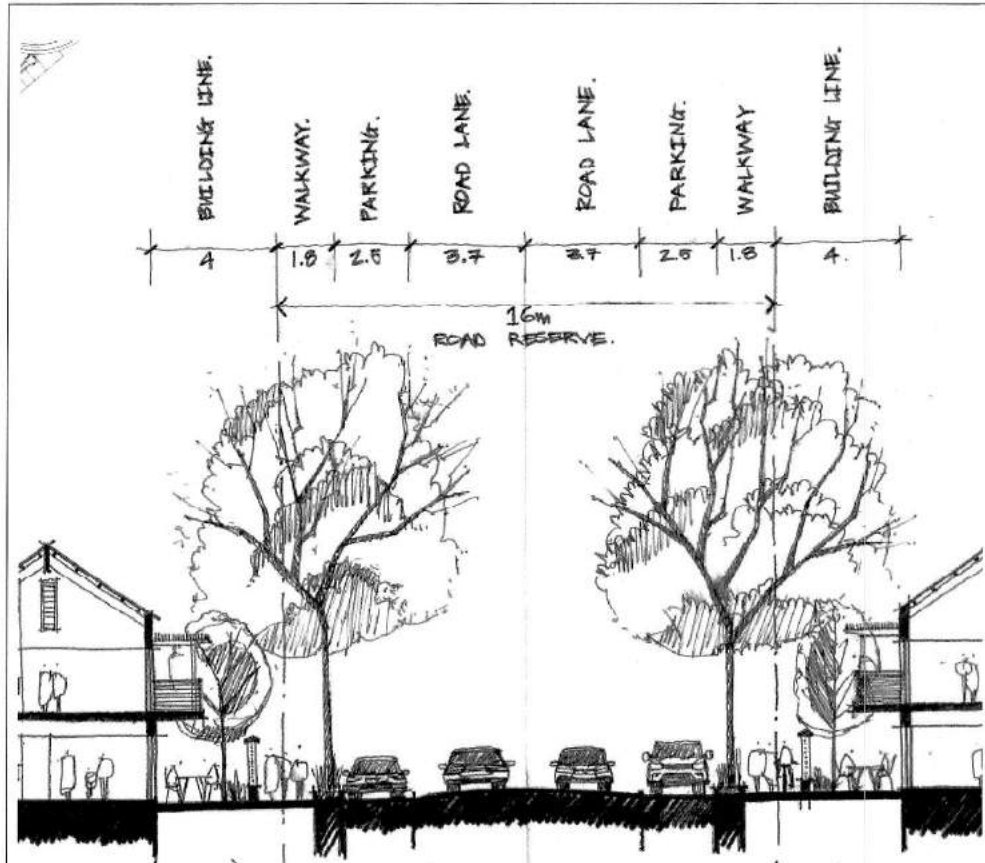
Section A-A illustrating the envisaged inter-connectivity between the residential component and the street activities and facilities.
